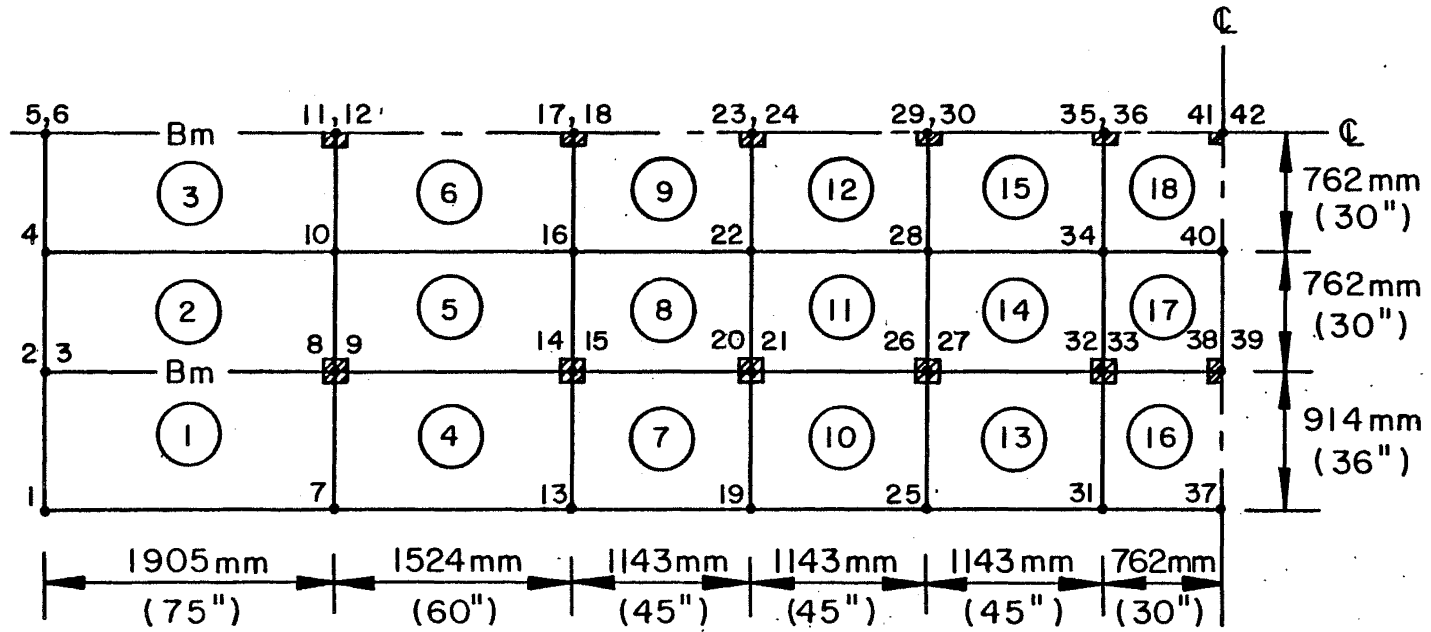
Example No. 1 (AASHTO, Bridge 3B)
